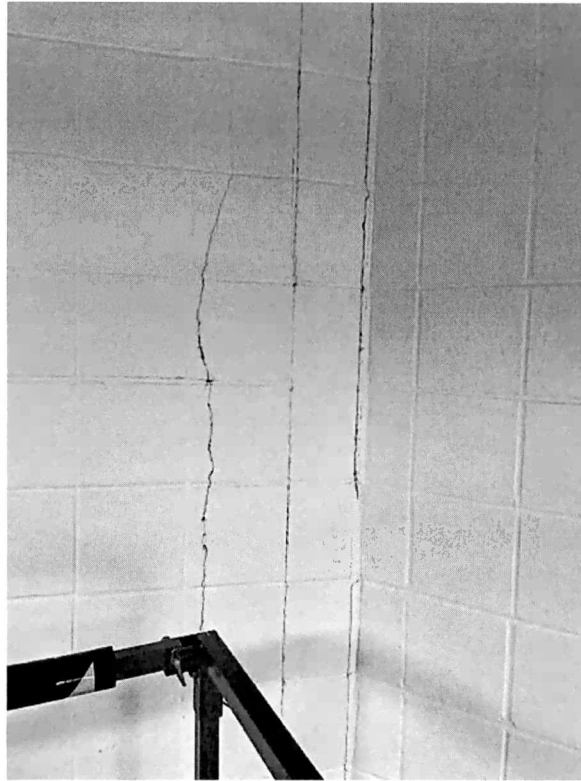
Settlement cracking. Unrelated to roof deck problems
